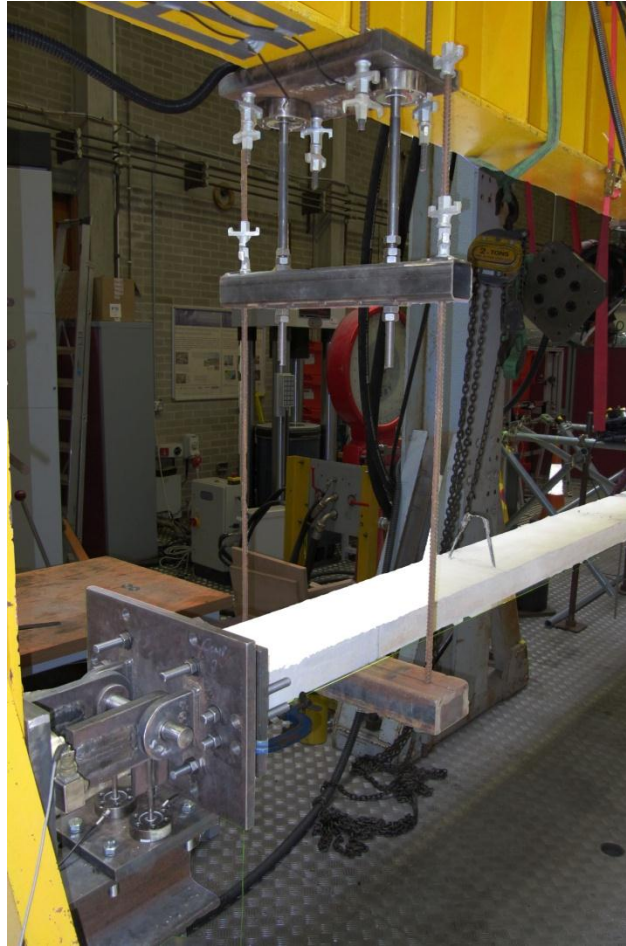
Photo of hanger assembly with load cell arrangement
